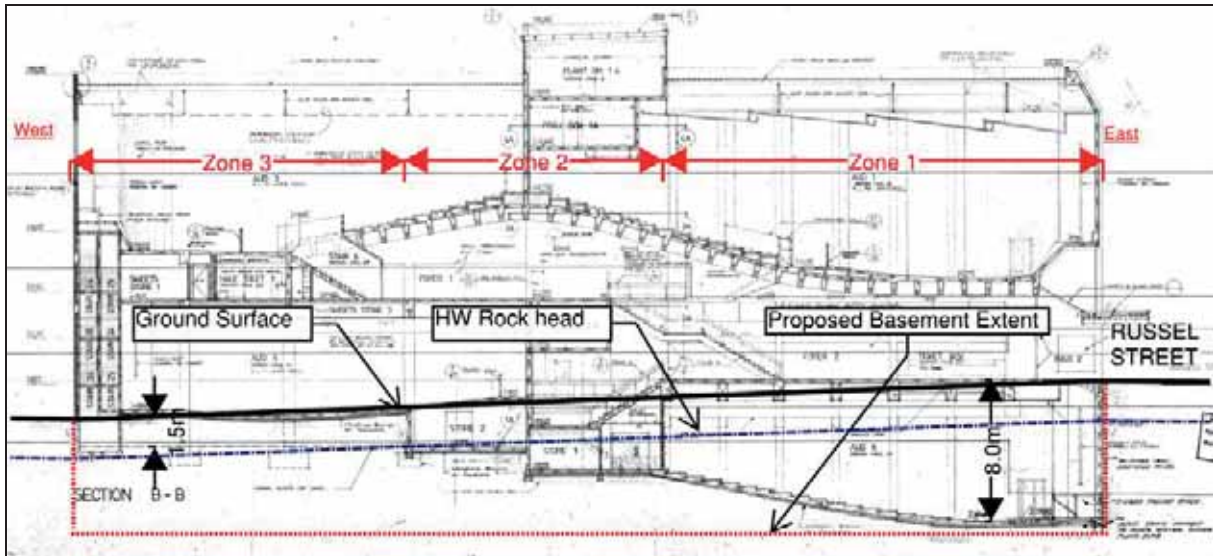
, typical cross section through the existing building showing the cinema auditoriums and varying basement depth.
